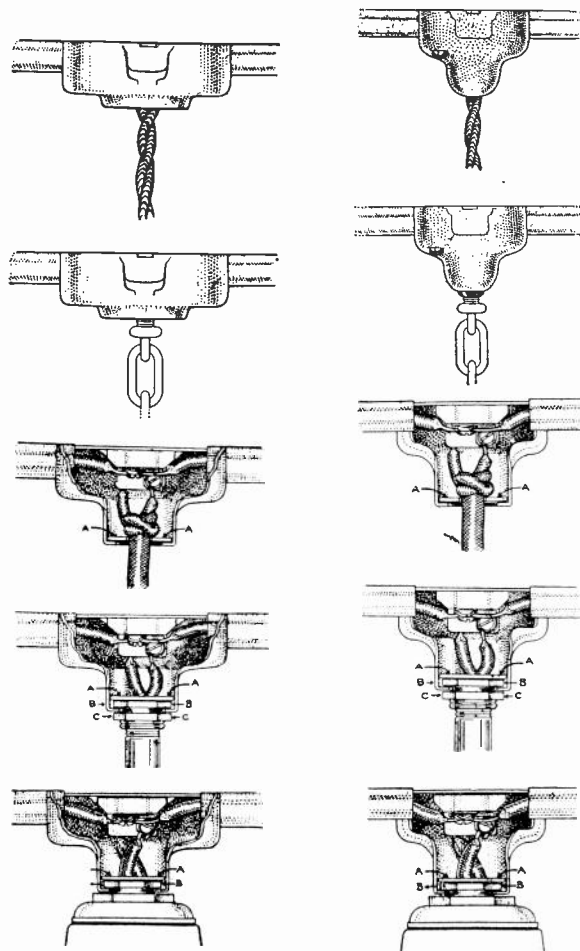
The above views show a number of styles of fittings used with metal molding and the method of making connections for fixtures. Note the connector blocks used for attaching fixture wires to the running wires.
